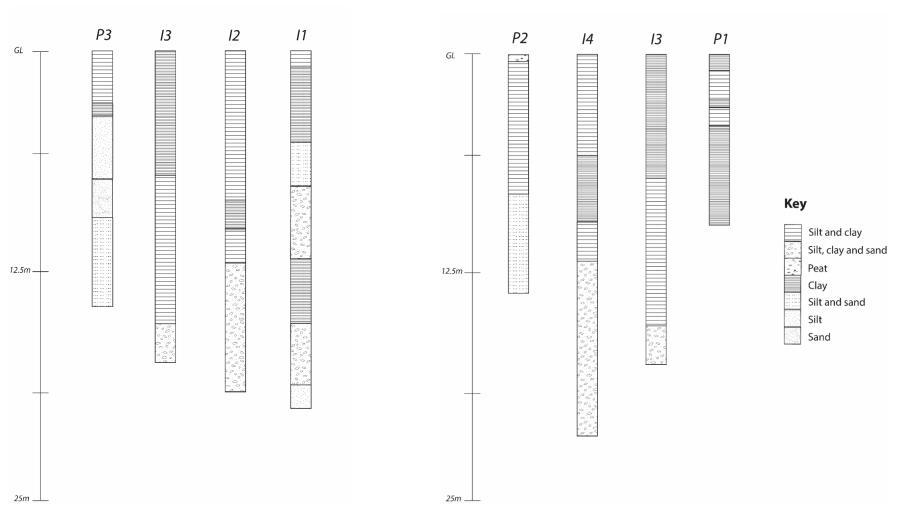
25 – Cross section of the CPTu data showing soil behavior type from northwest to southeast along the valley (a) and southeast to northwest (b). I=Insitu and P=Pagani.
